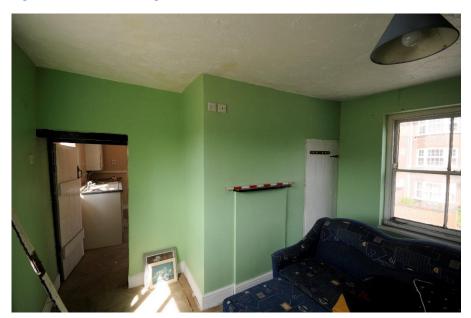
Room F2, looking north-west. Note blocked fireplace and cupboard adjacent. A stair was formerly located adjacent to the left of the fireplace
